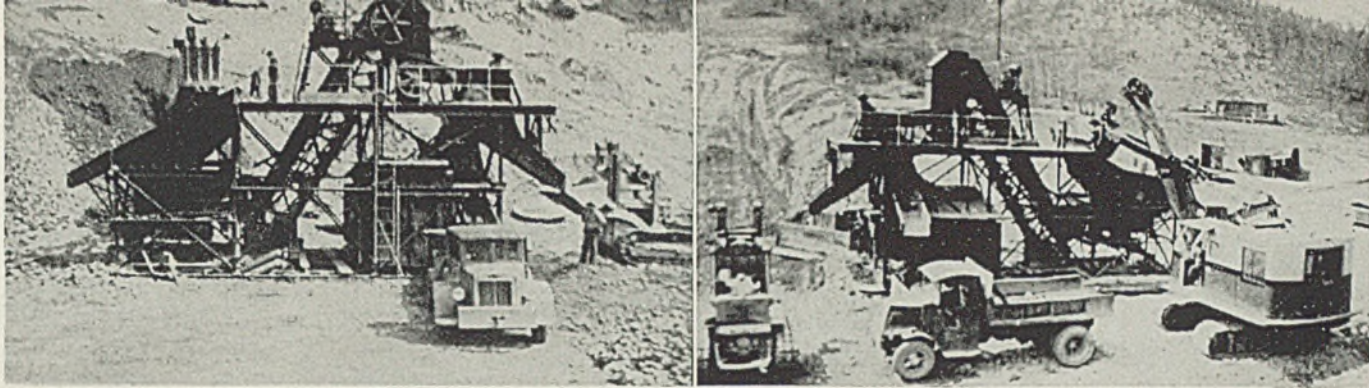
(Left, above)—Side view of separating machine which is positioned near the digging operation
